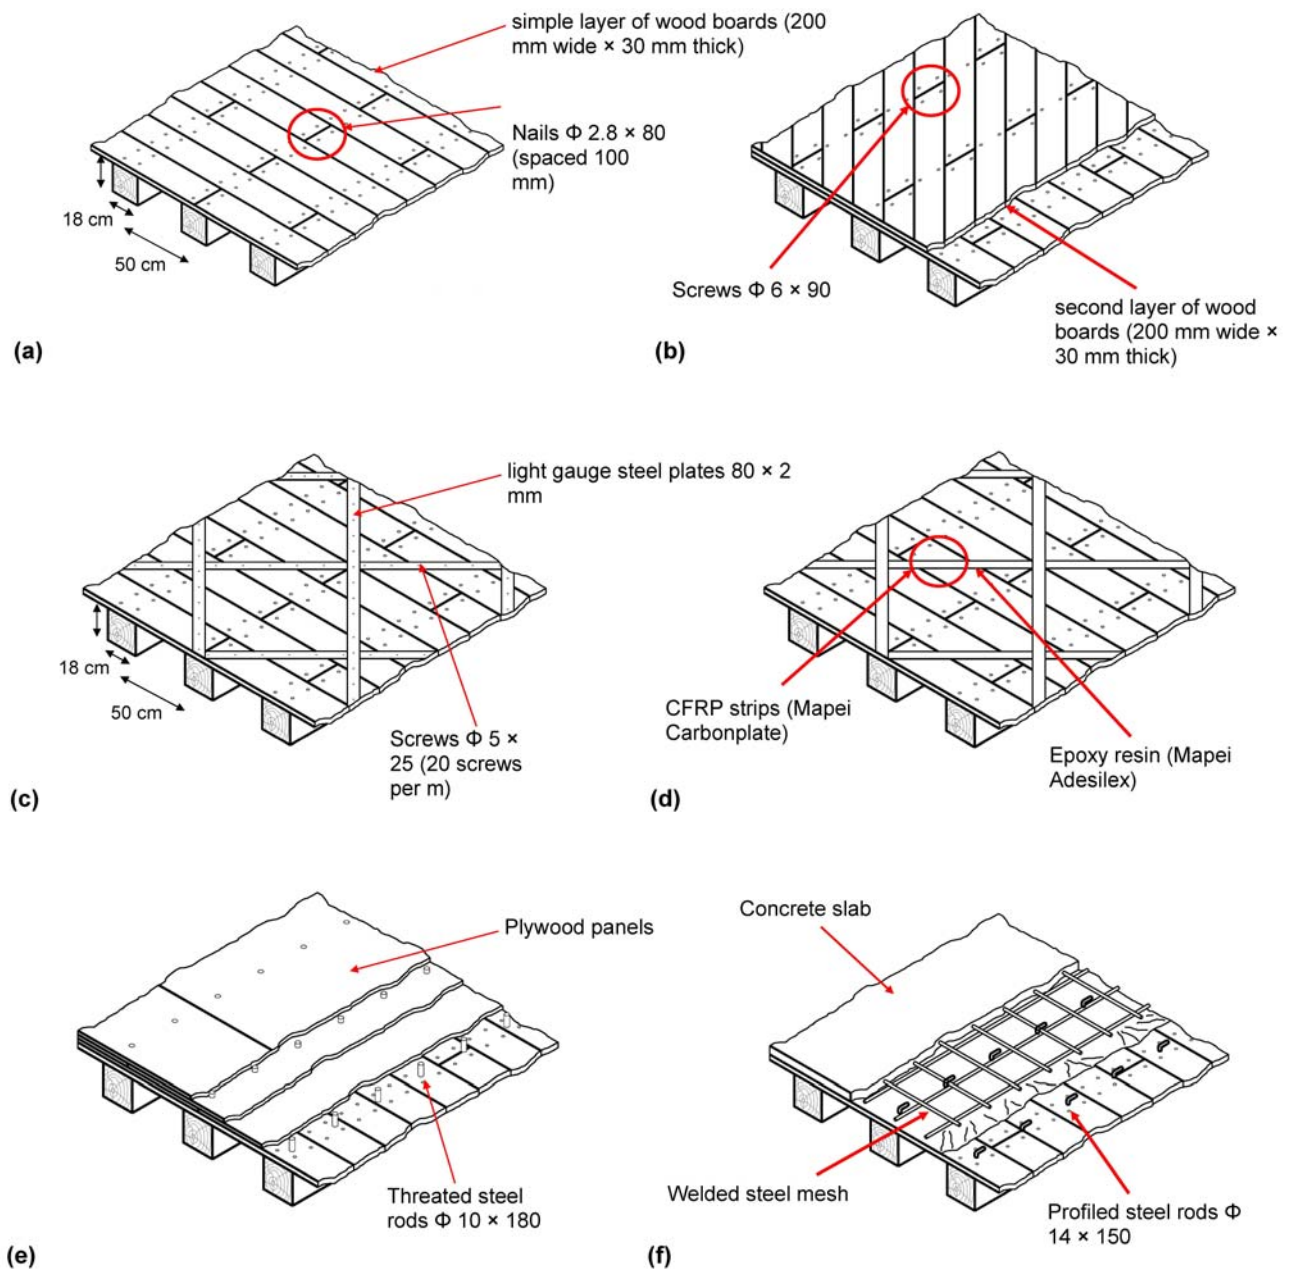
Different timber floor in plane shear strengthening techniques: (a) existing simple layer of wood planks on the timber beams; (b) second layer of wood planks crossly arranged to the existing one and fixed by means of steel screws; (c) diagonal bracing of the existing wood planks by means of light gauge steel plates; (d) diagonal bracing of the existing wood planks by means of FRP laminae; (e) three layers of plywood panels glued on the existing wood planks; (f) a RC slab connected by means of studs (all measures in mm)
